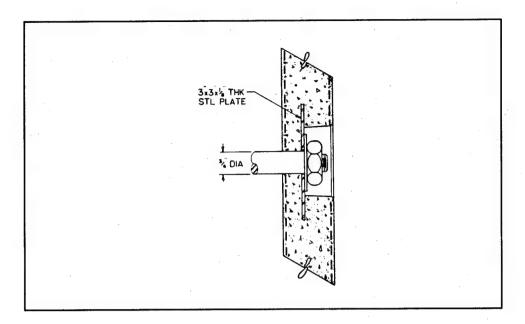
Details of anchoring system for precast polymer concrete panels used in Sumner Tunnel, Boston (from Barnaby and Dikeou 1984)
